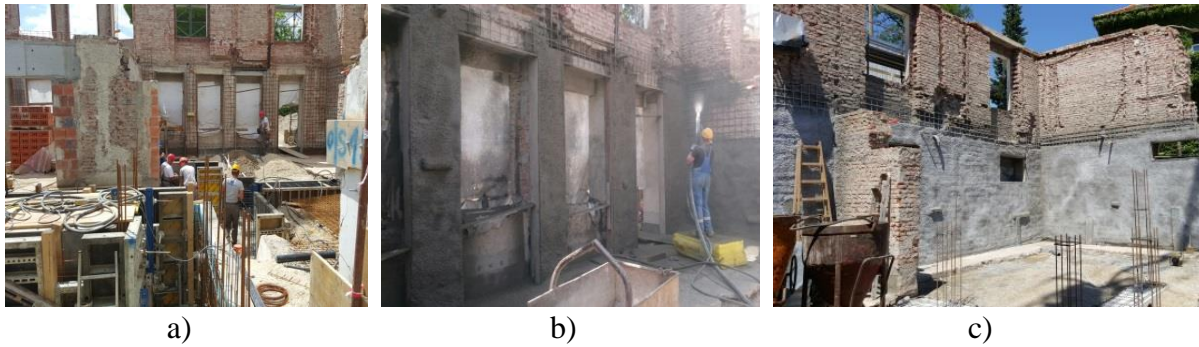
a) installation of the reinforcing mesh on the walls, b) the walls gunite concrete in progress , c) the walls after gunite concrete is done
